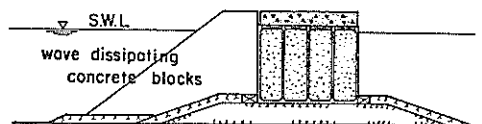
Mixed Type Breakwater Covered with Wave Dissipating Concrete Blocks
